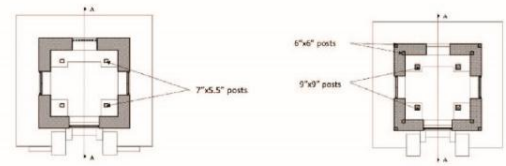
Ground floor plan old (left) and new (right) showing additional posts for reinforcement
